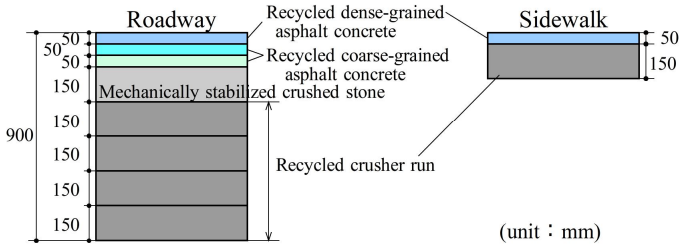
Example of pavement configuration of a roadway and sidewalk³⁾
